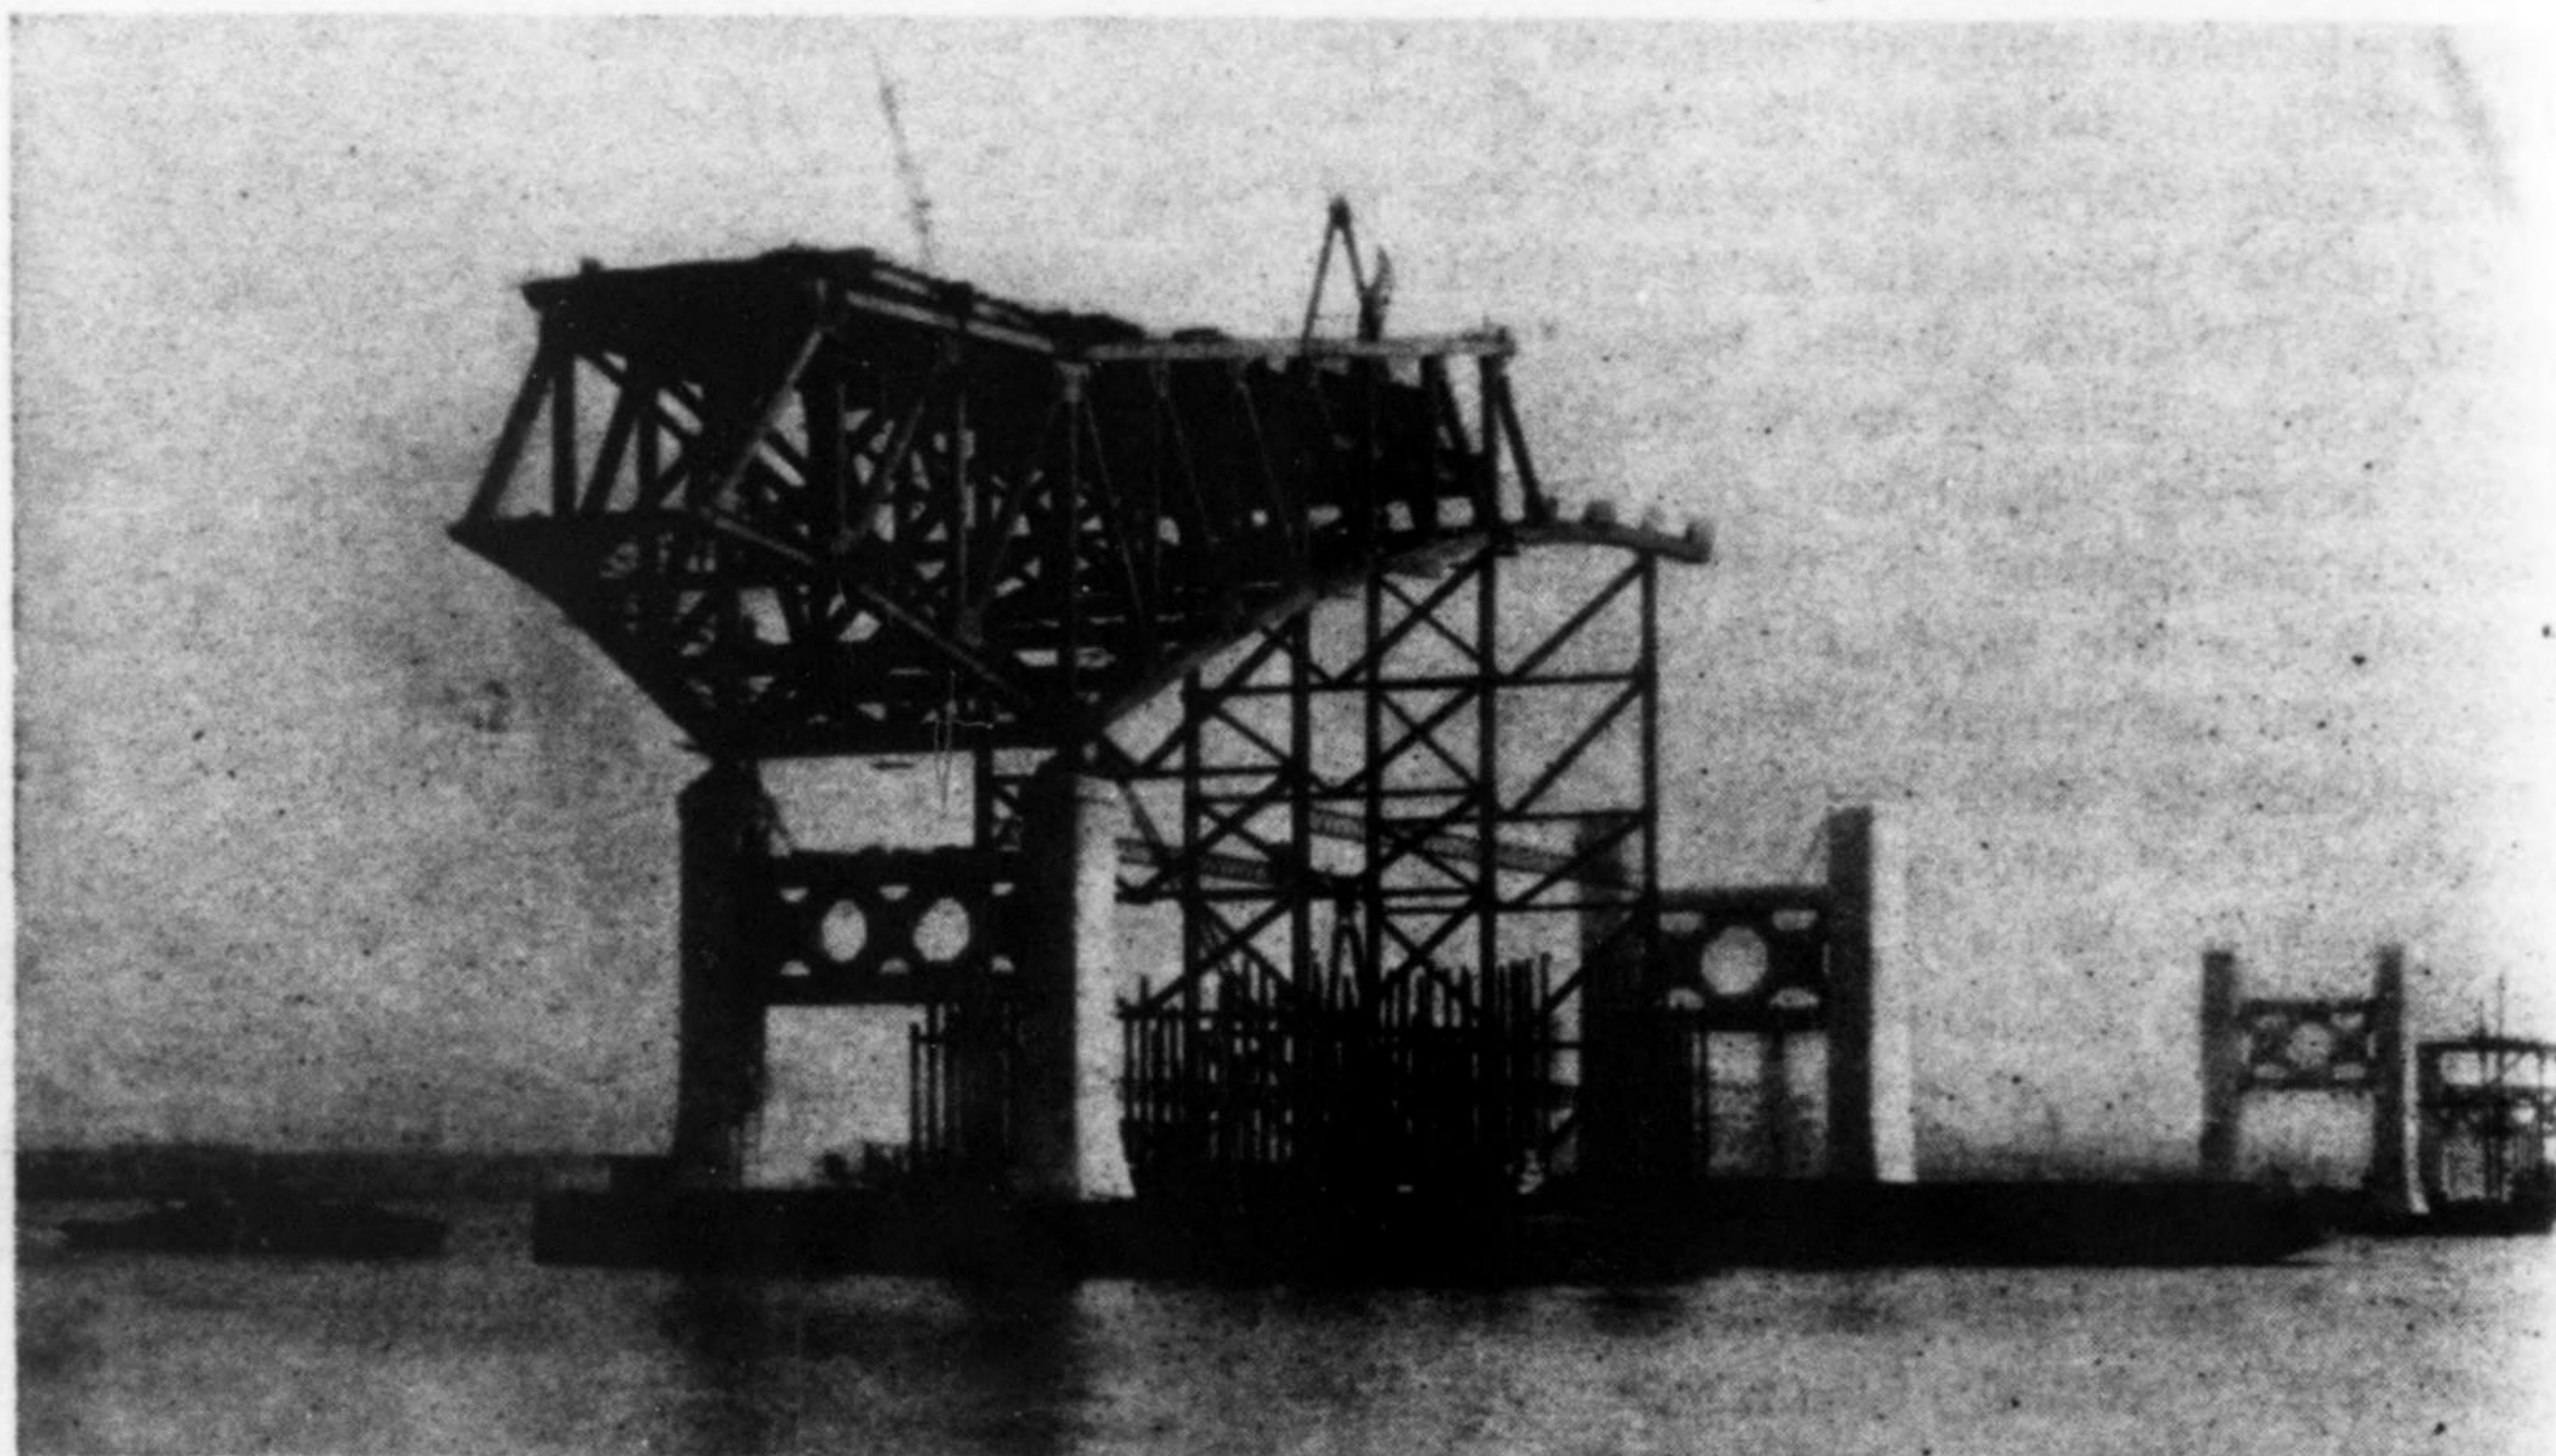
Erecting west anchor arm of Hackensack River span. This bridge and the Passaic River crossing are duplicate structures.
